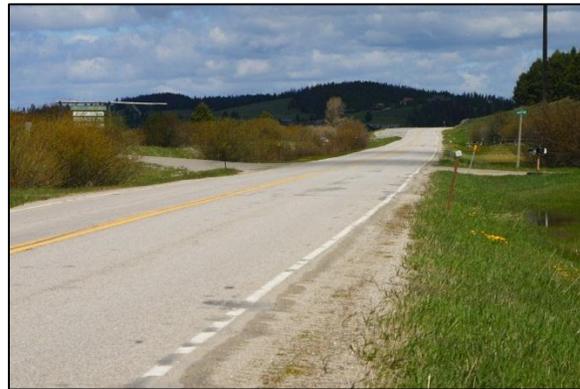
Narrow roadway with deteriorating surfacing near RP 24.5.
